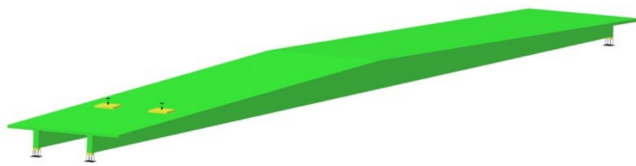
Non-linear finite element model of prestressed concrete roof girders in software Atena Science.
